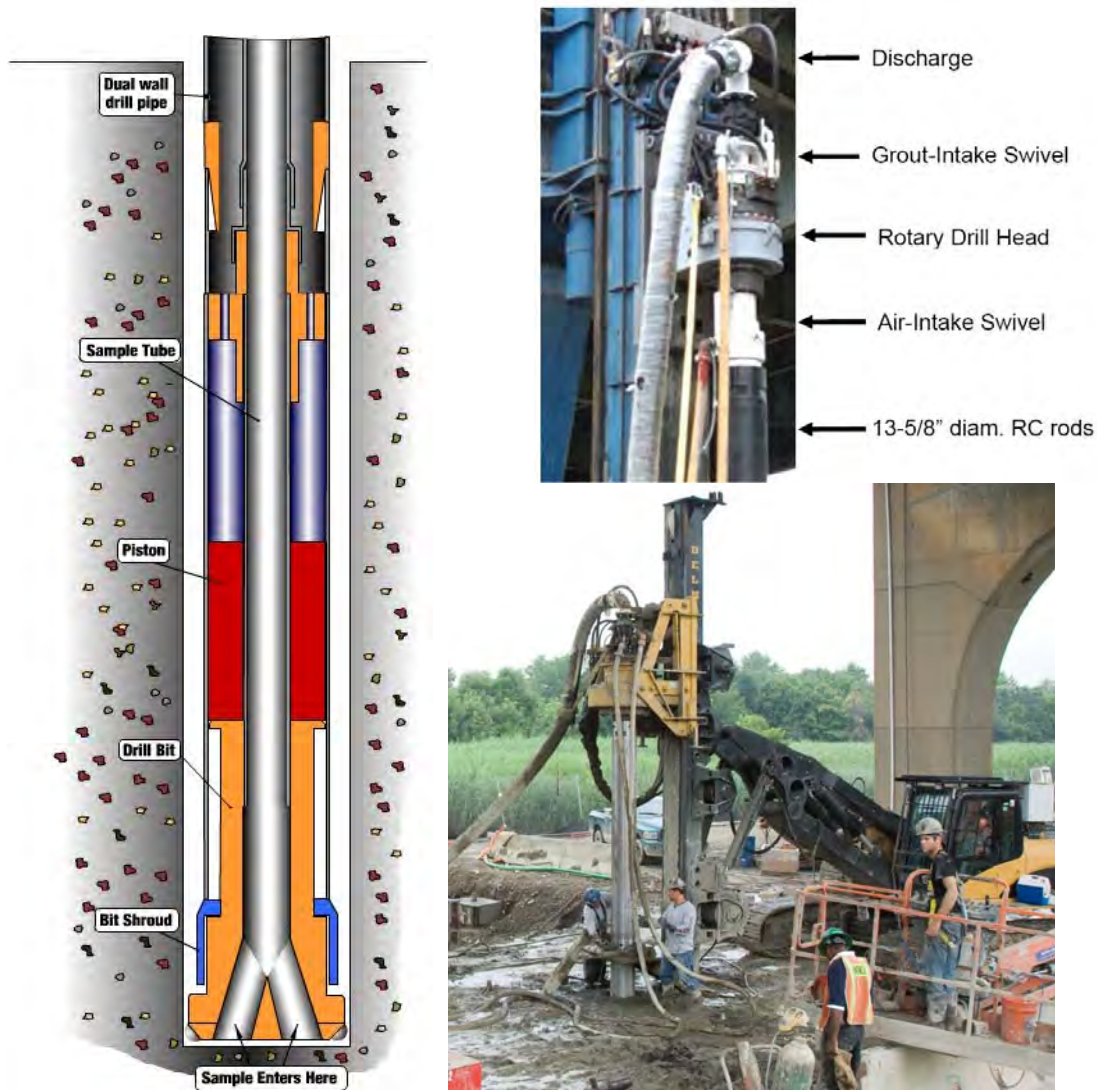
Hammer Grout Piles at the Bronx Whitestone Bridge
